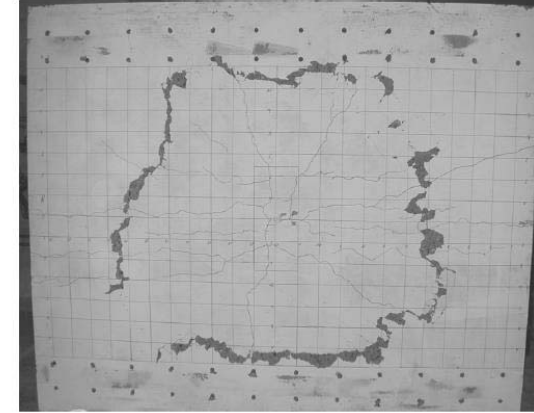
Typical punching shear failure [El-Gamal et al. 2004].
